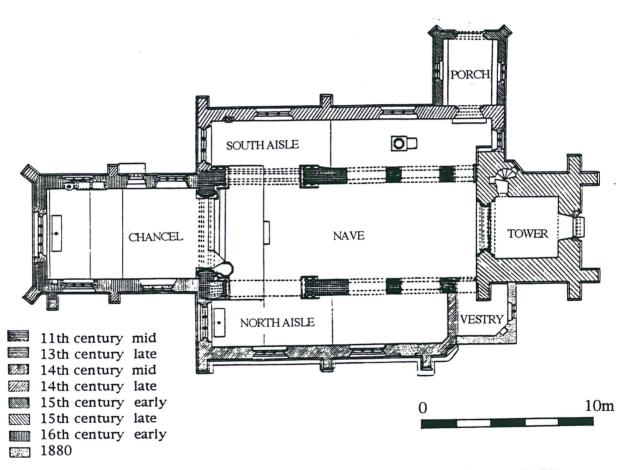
Plan of Great Paxtom Church (After Dickinson 1973)
